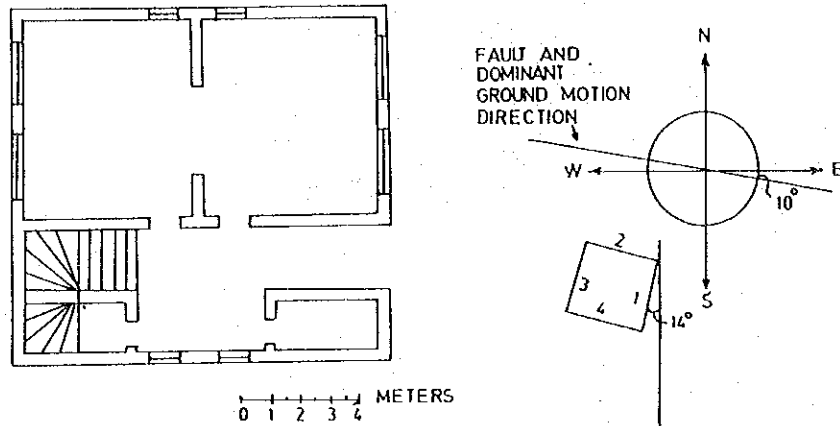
Plan and Orientation of Muradiye Junior Highschool Annexe.
